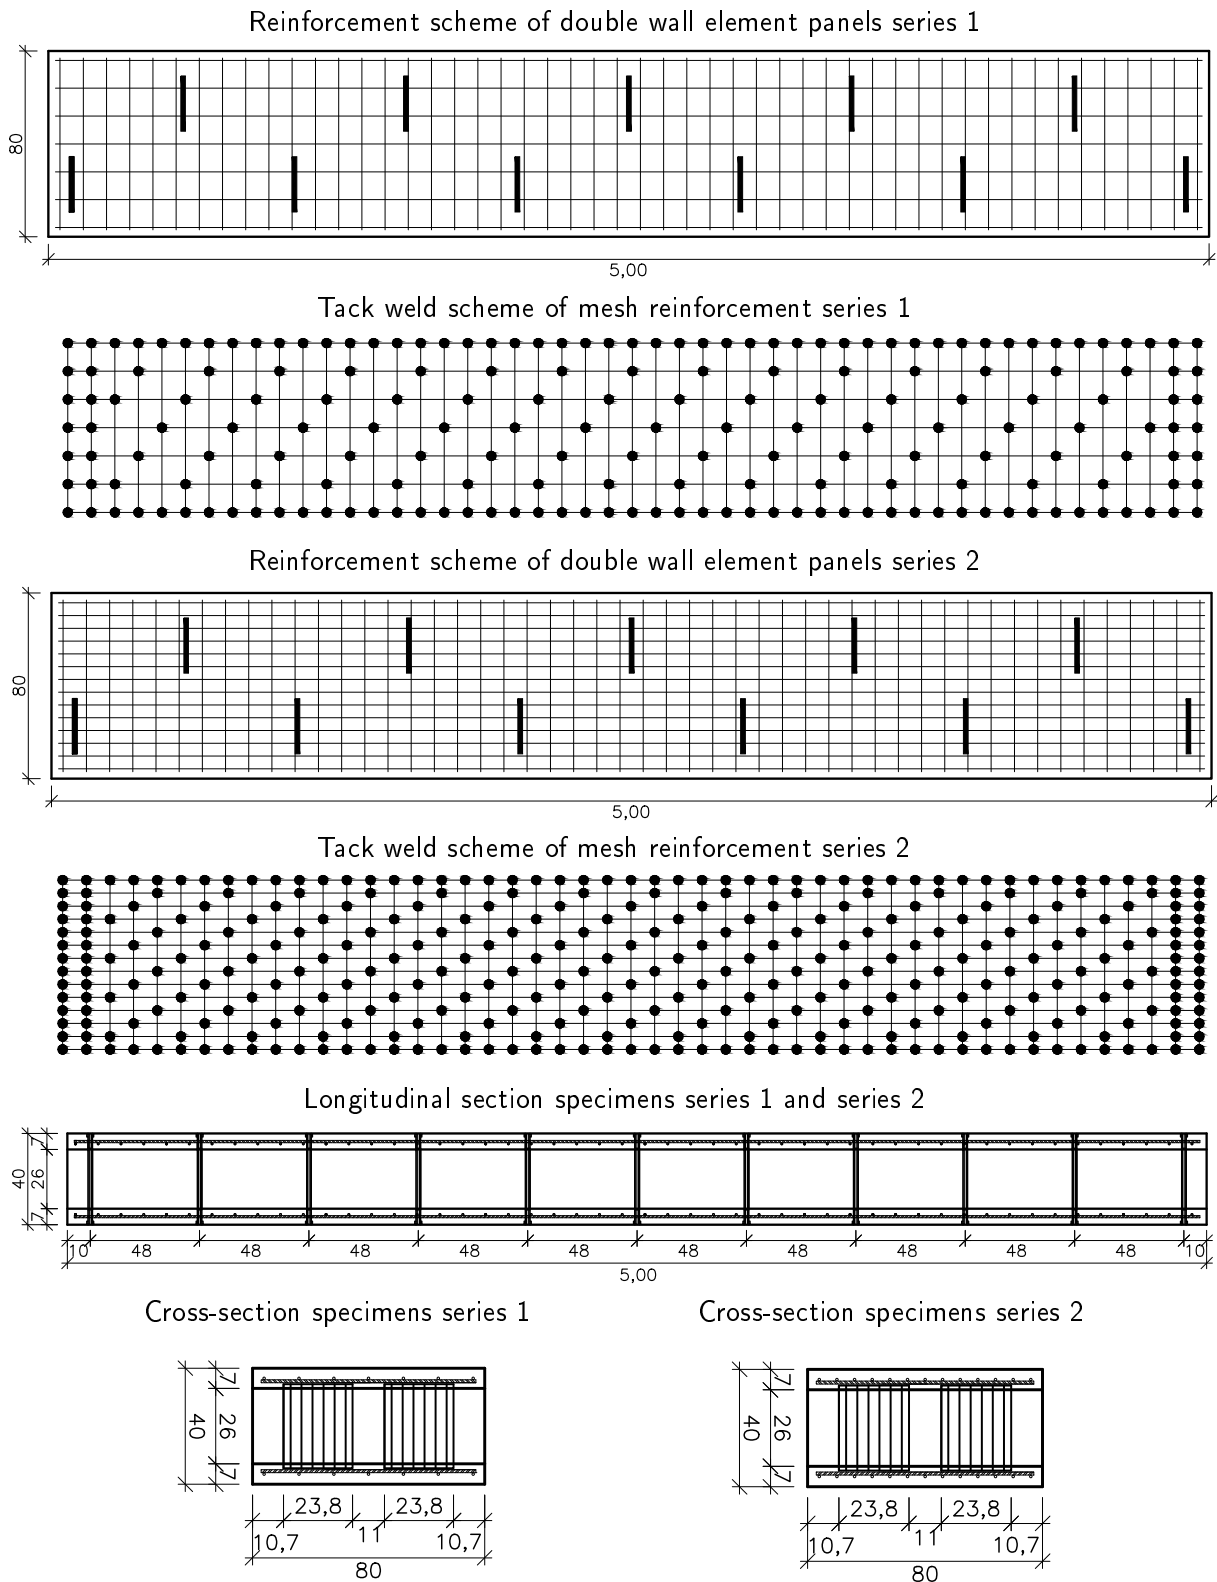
Reinforcement and tack weld schemes for specimens of series 1 and series 2. The tack weld scheme were generated automatically. Eleven KAP-steel-waves were used as connecting elements between the double wall panels in each test girder.
